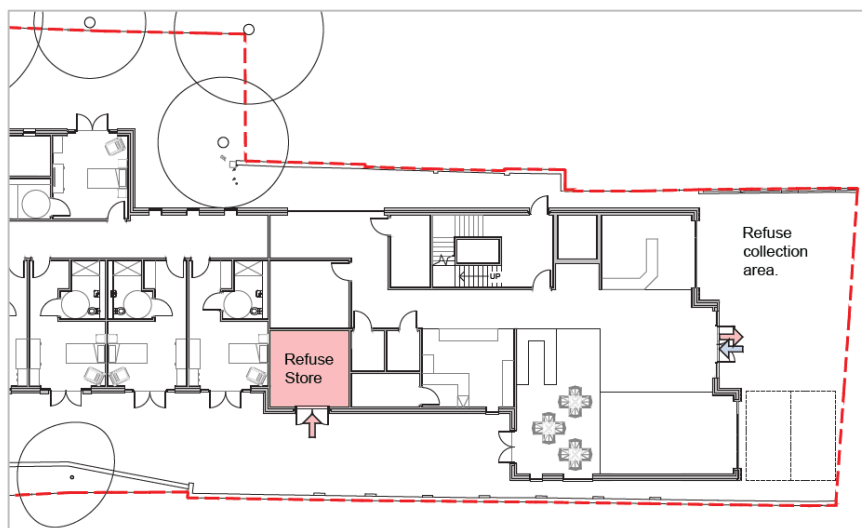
Ground Floor Refuse Store Location – North Hill (DWA Architect, 2021)
